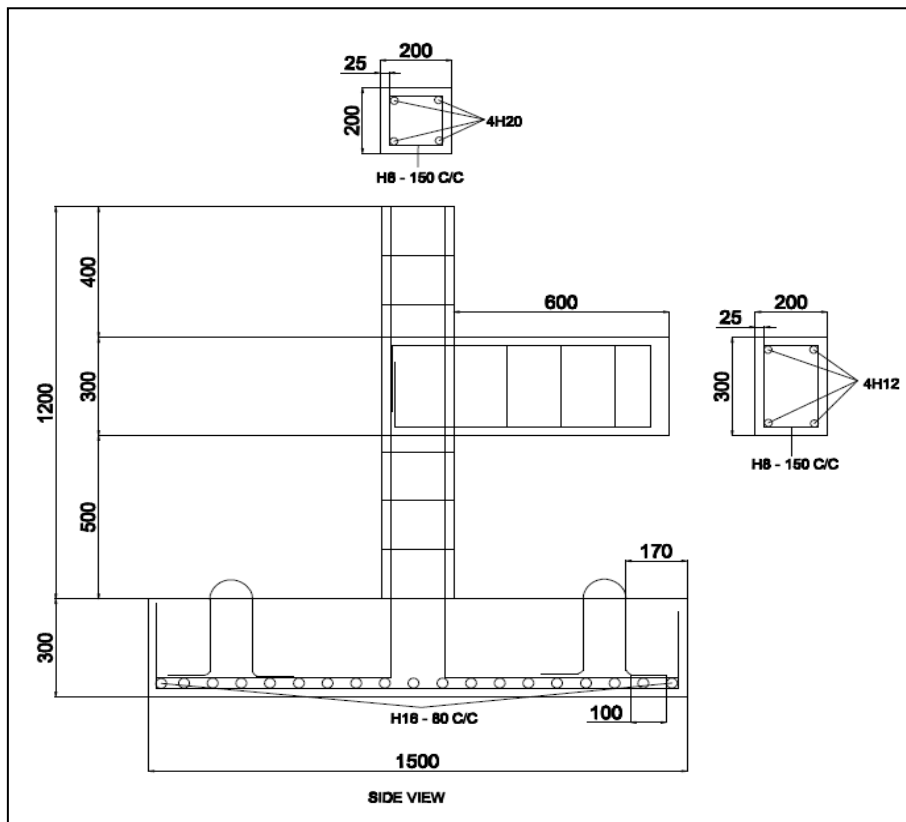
Details of the RC beam-column joint (all dimension measured in mm)
